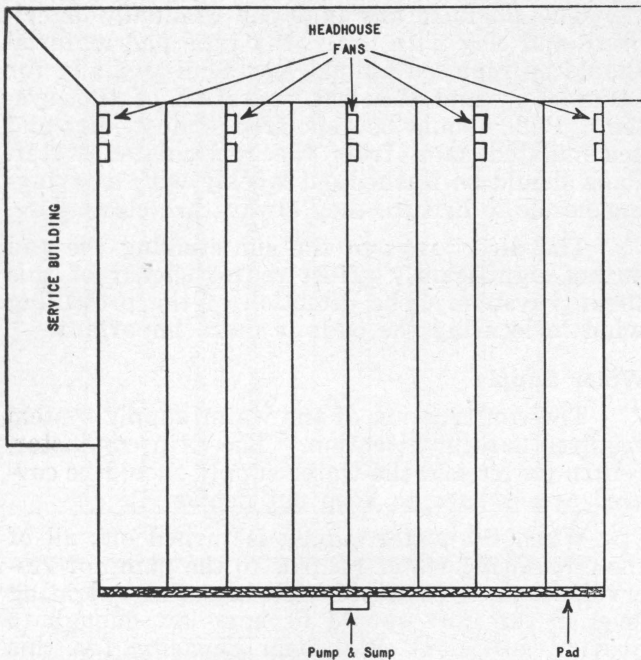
Installation showing fans mounted in roof on ridge and furrow construction.
